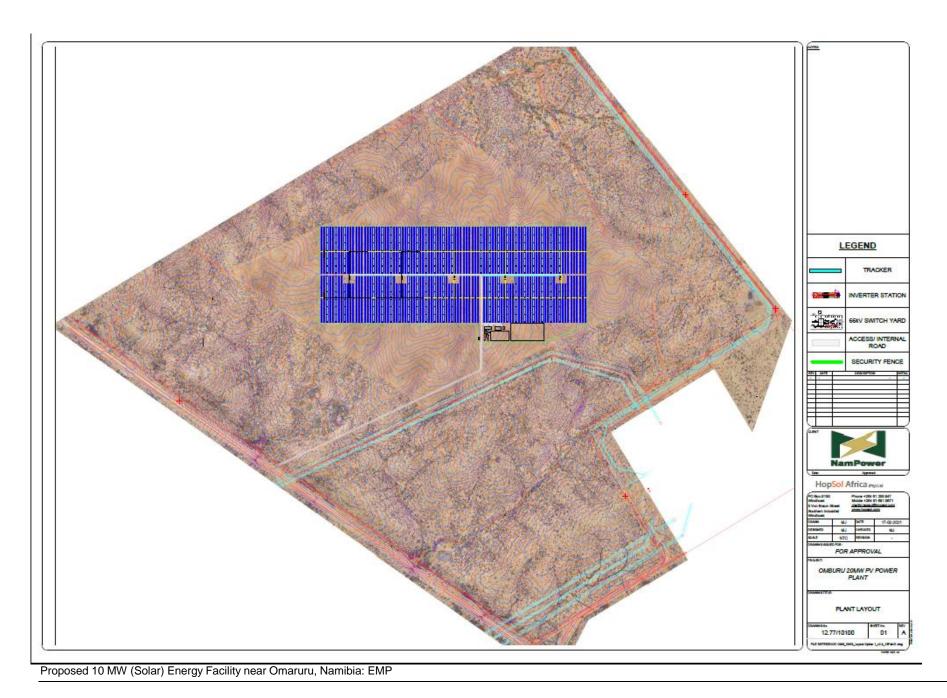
Proposed layout of the 55 MW solar facility near Omaruru
